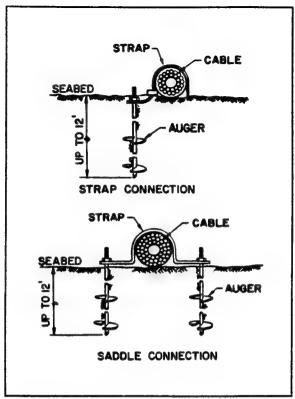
Pin Anchor and Strap Stabilization (NAVFAC P-990 1978).
